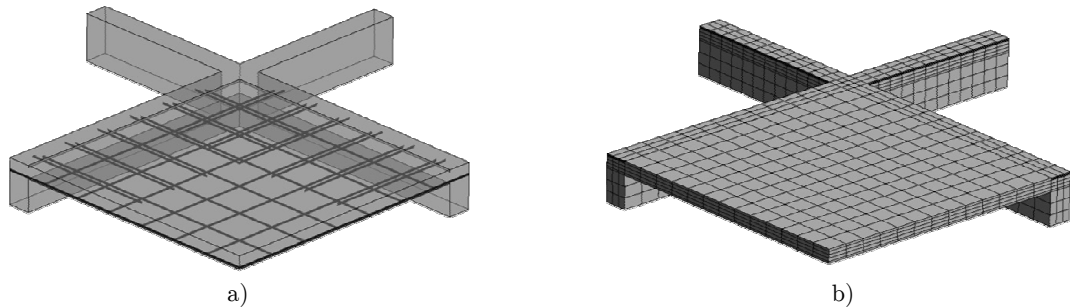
Meshes: a) steel reinforcement in the slab and b) concrete.
